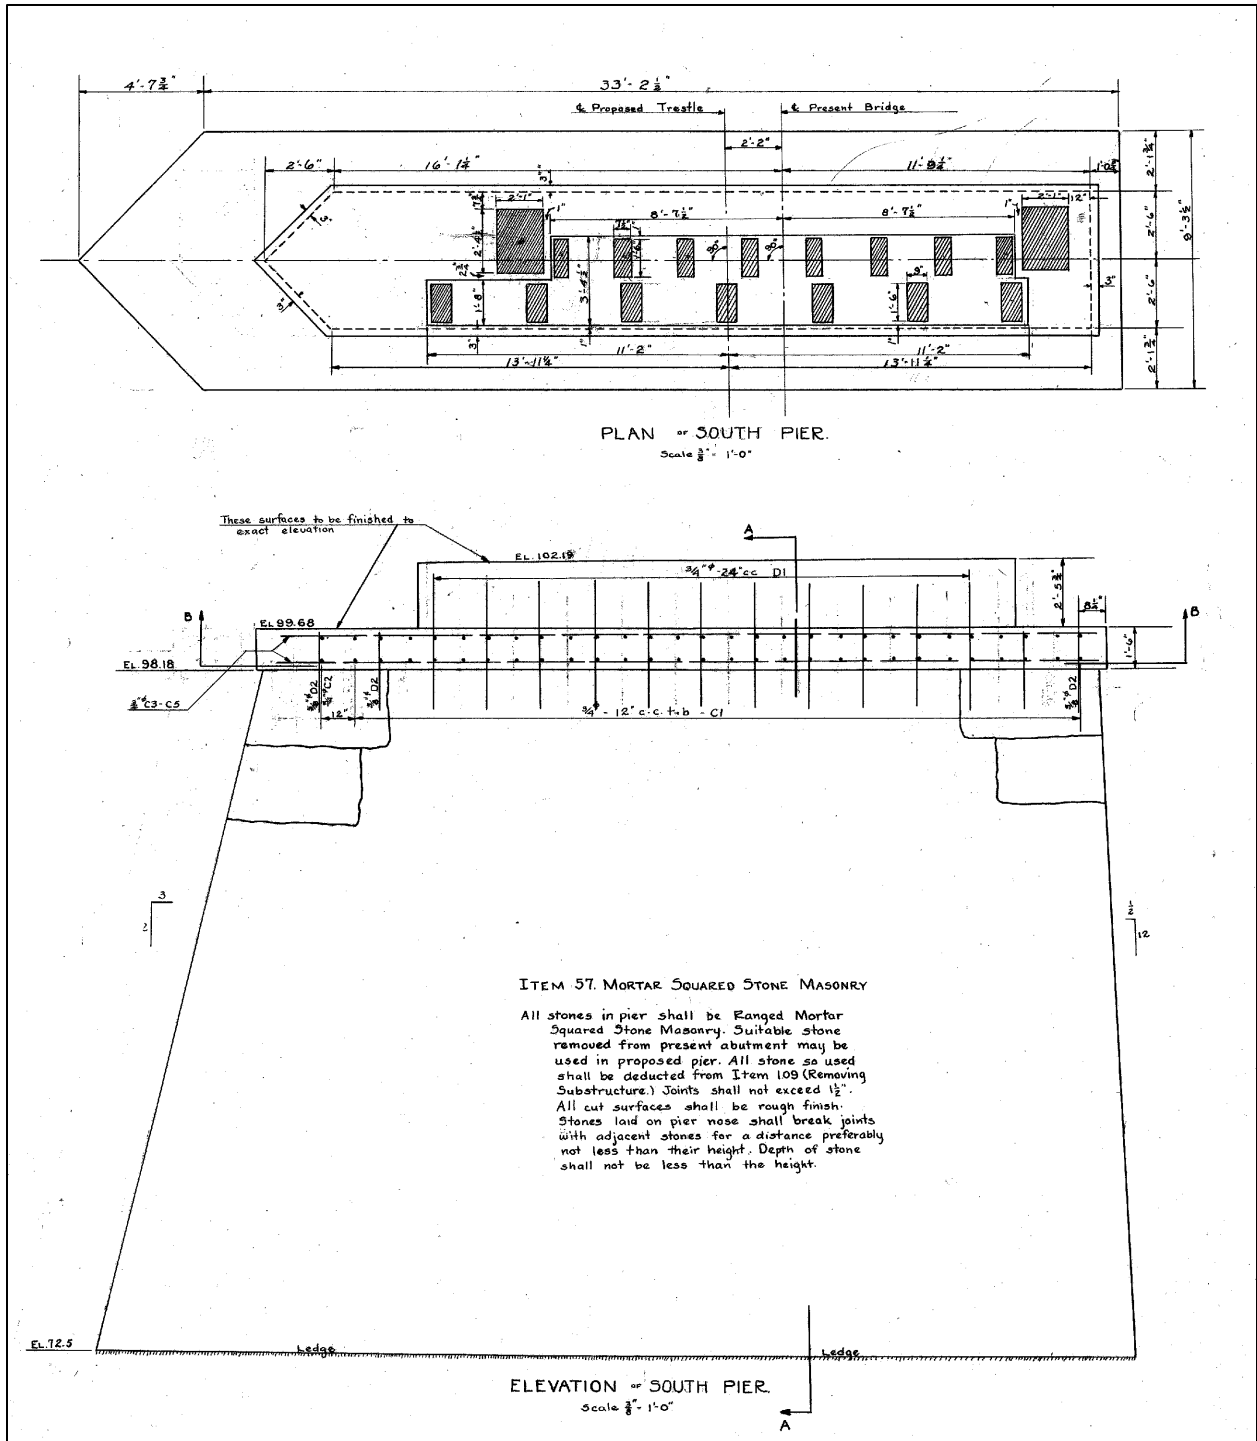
Sewall's Falls Bridge, south pier built 1937 from stone salvaged from 1873 abutment. Clip from New Hampshire Highway Department plan sheet 3 of 4, dated 12/15/1936. See attached documentation Drawing 11 (NHDOT Bureau of Bridge Design).
